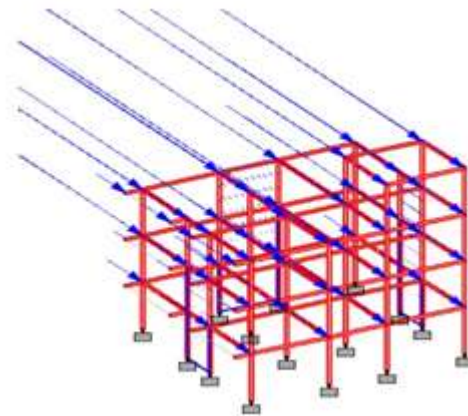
Seismic Load Acting on Building EQ+Z
